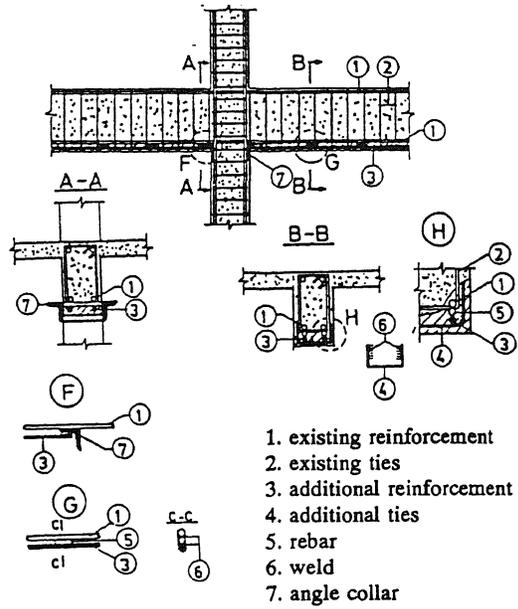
One side jacking of beams (UNDP/UNIDO 1983)
